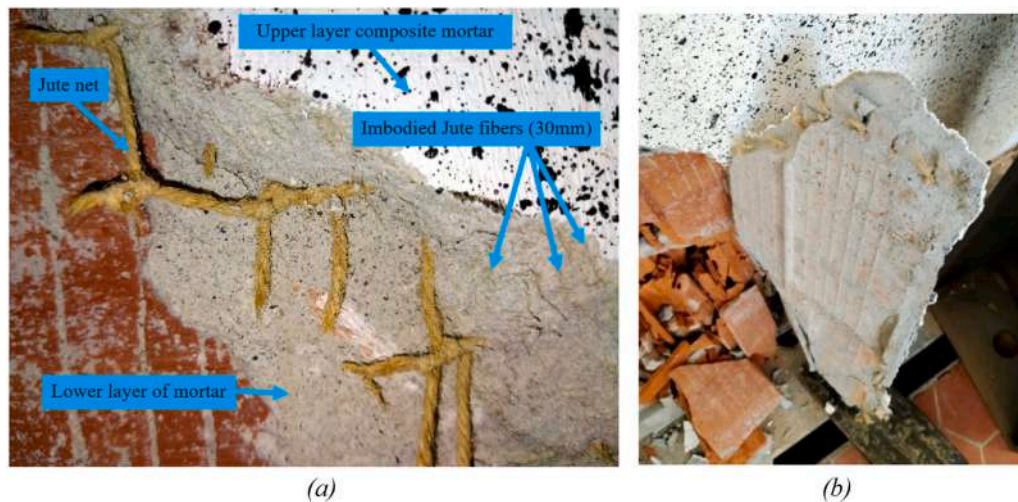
(a) Composite structure (masonry wall-HBW5), and (b) Local collapse of a masonry structure (HBW3).
